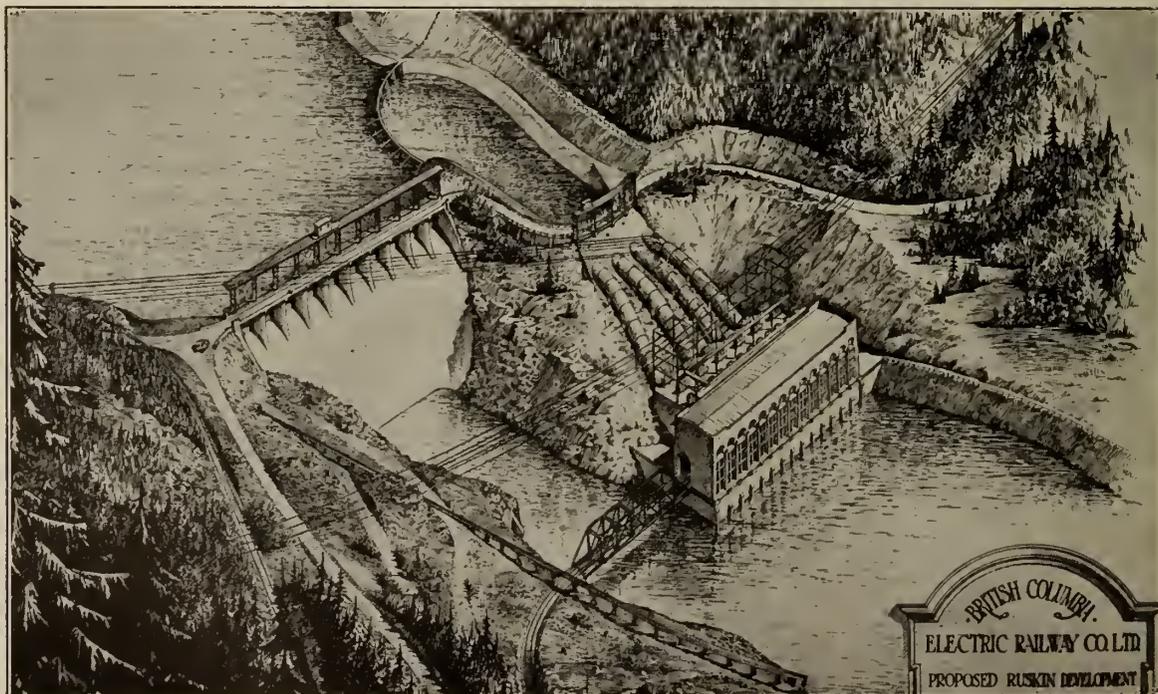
Perspective Study of Proposed Ruskin Development.
